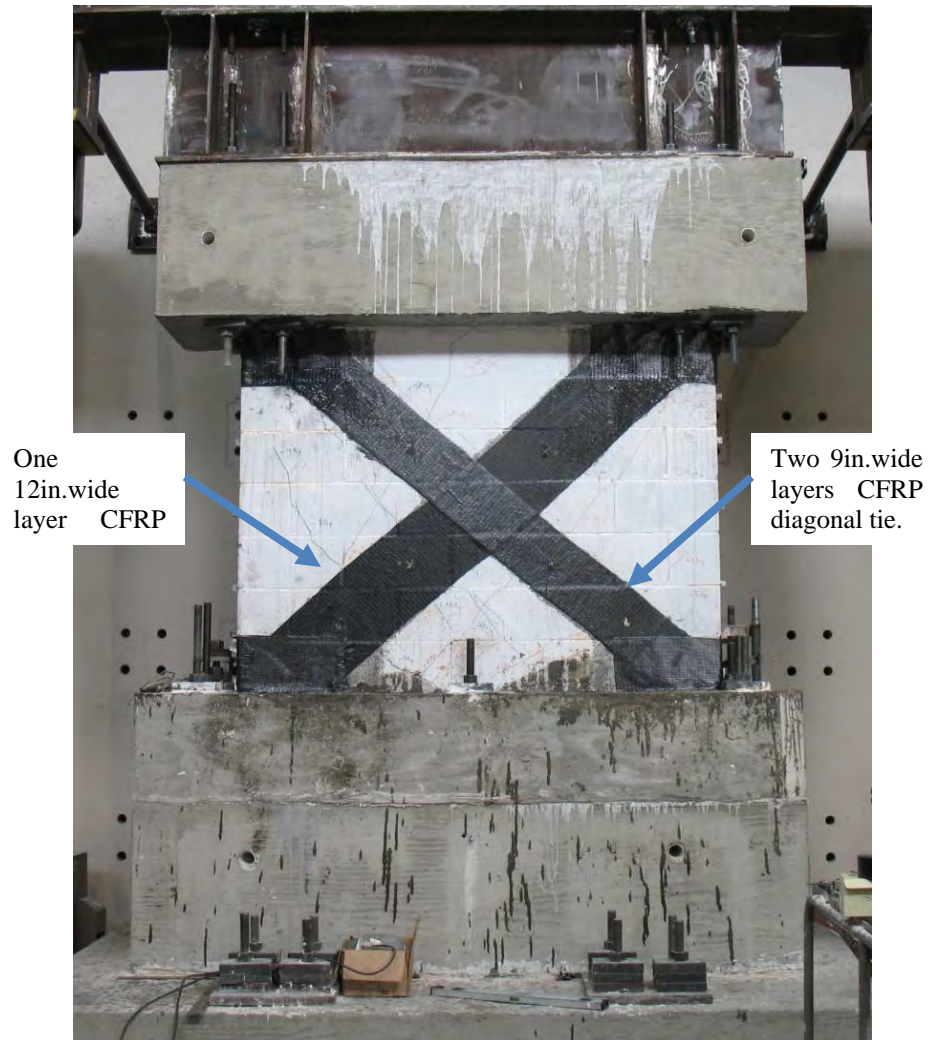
Front view (West side) of the masonry wall retrofitted
